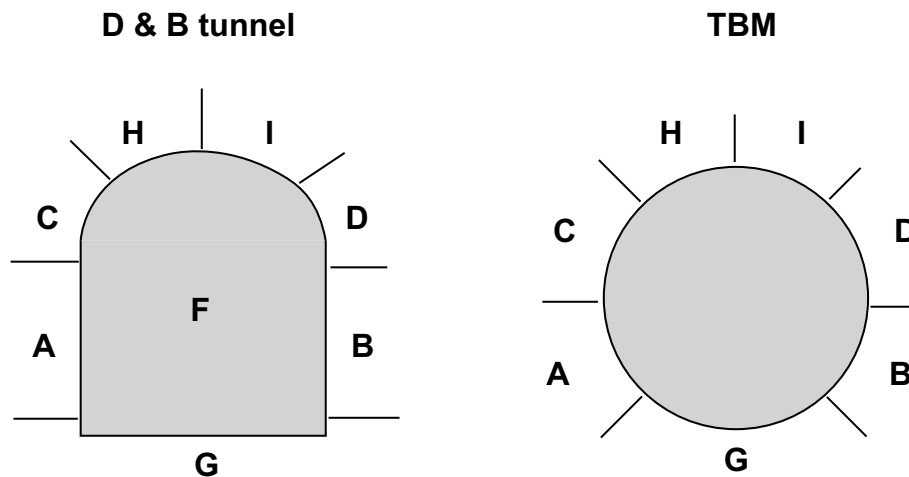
Code for position of objects in the Äspö tunnels (drill-and-blast tunnel and TBM tunnel).
